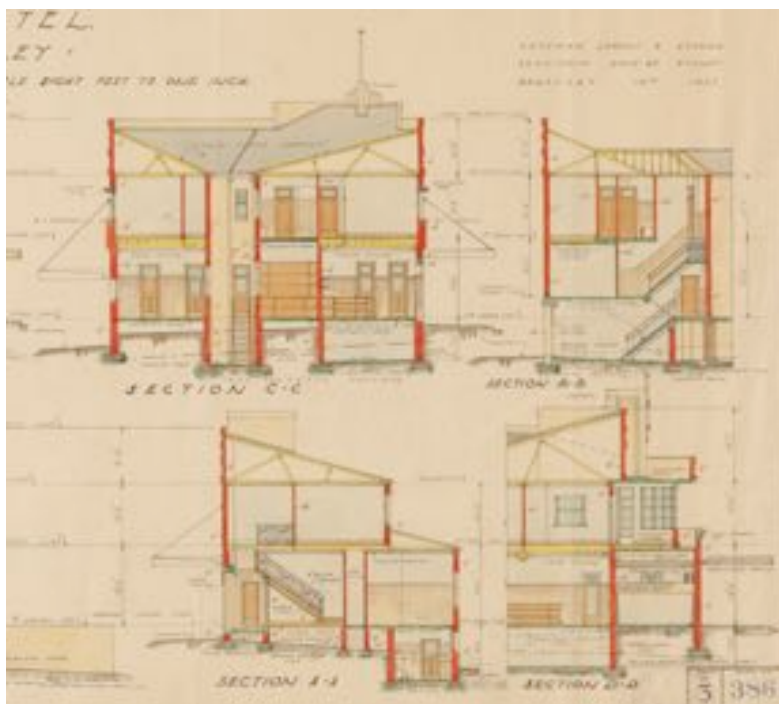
Re-Building Robin Hood Hotel, Cross sections of the hotel as designed.
